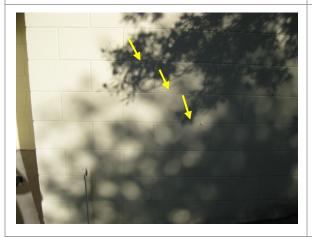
Hairline Cracking along Mortar Joints on West Wall – External View
